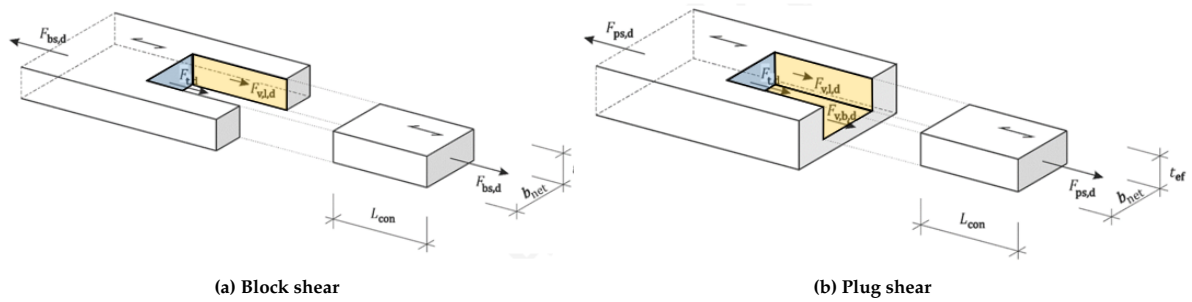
Block- and plug shear failure. Tension planes marked in blue and shear planes in yellow. Adapted from [1, Fig. 11.25 & Fig. 11.26].
